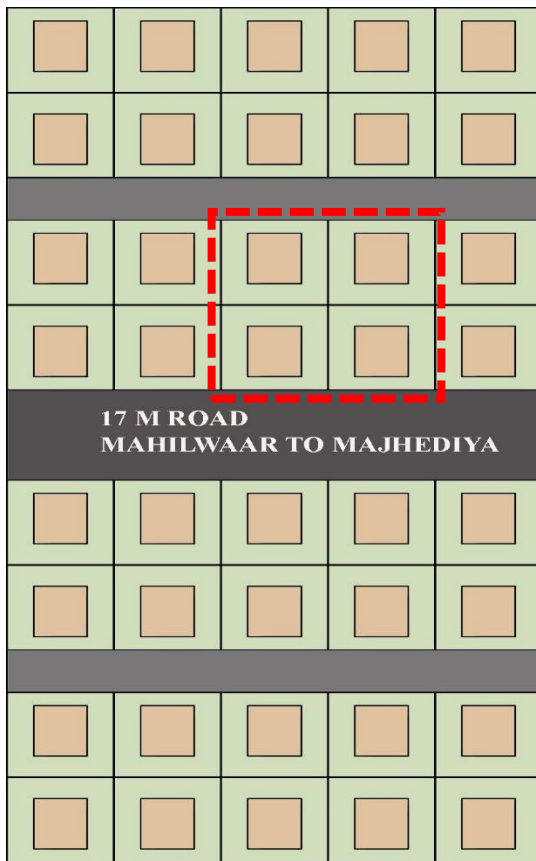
48 Building arrangement for Setback 2.5m & 4m
